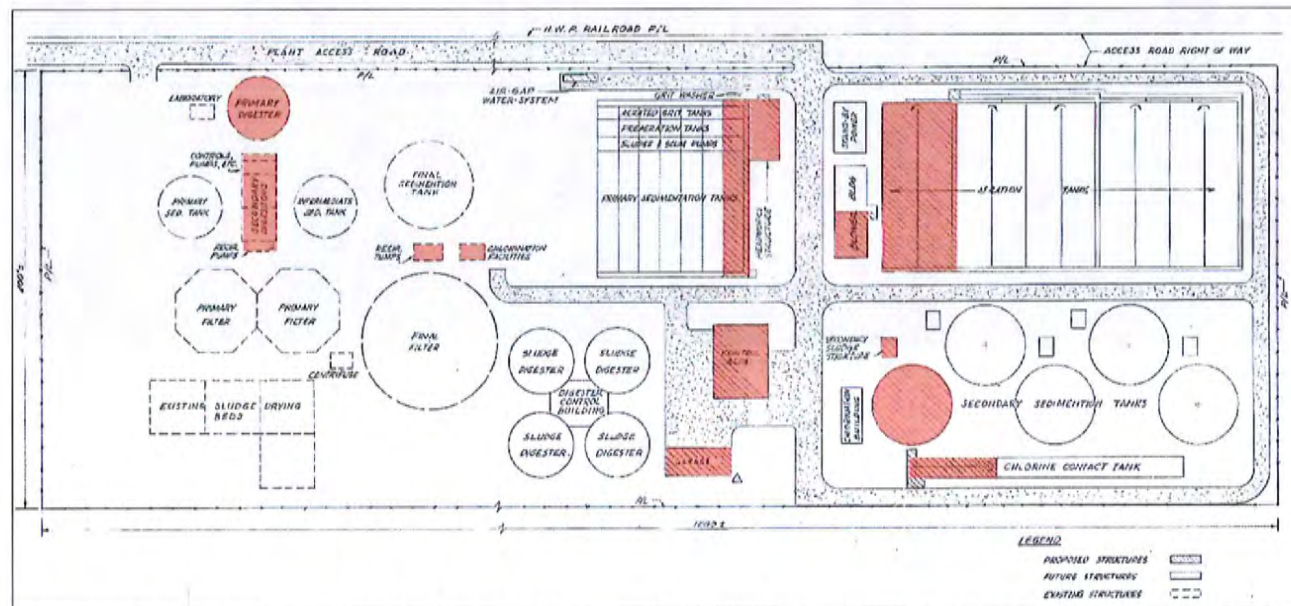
The site plan showing the existing and proposed buildings of the treatment plant in 1966; the structures that are still extant are highlighted in red (M. C. Yoder Associates, 1966).
